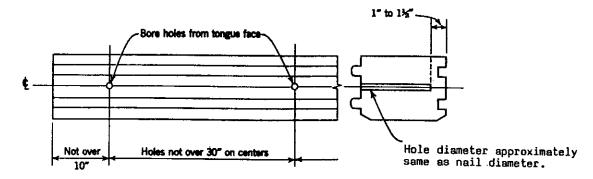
Boring Detail. Locate end holes not over 10 inches from end of piece.
